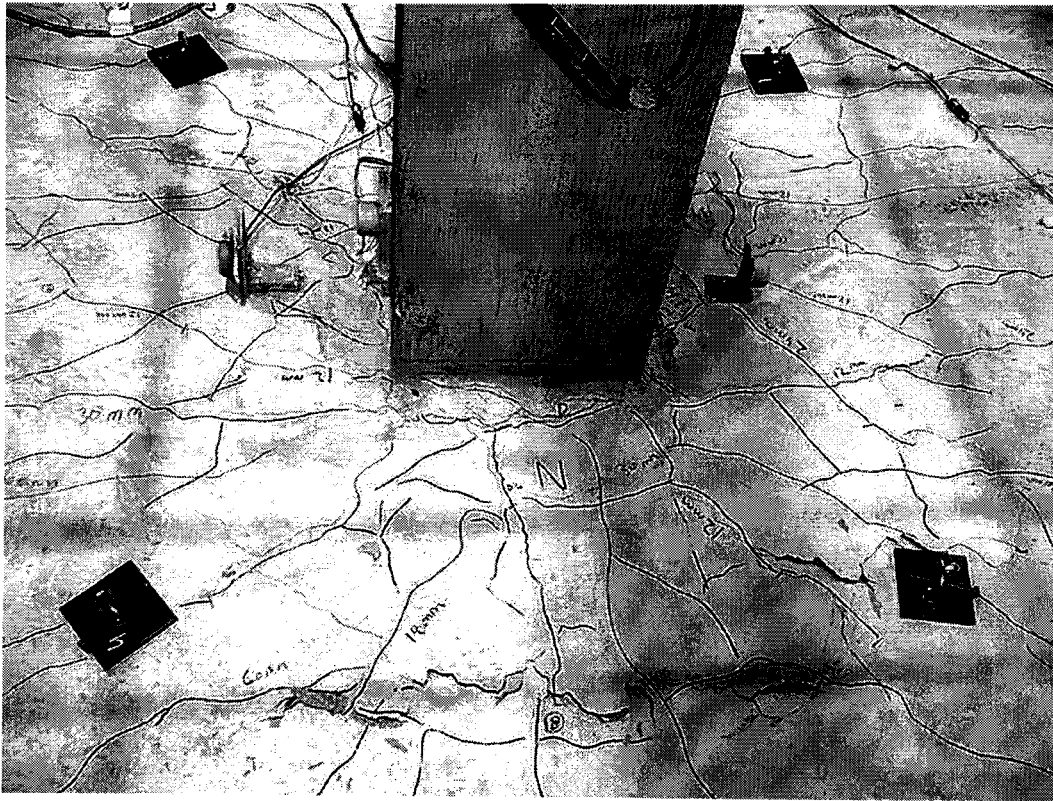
(a) Crack Pattern of Sp-B after Failure
